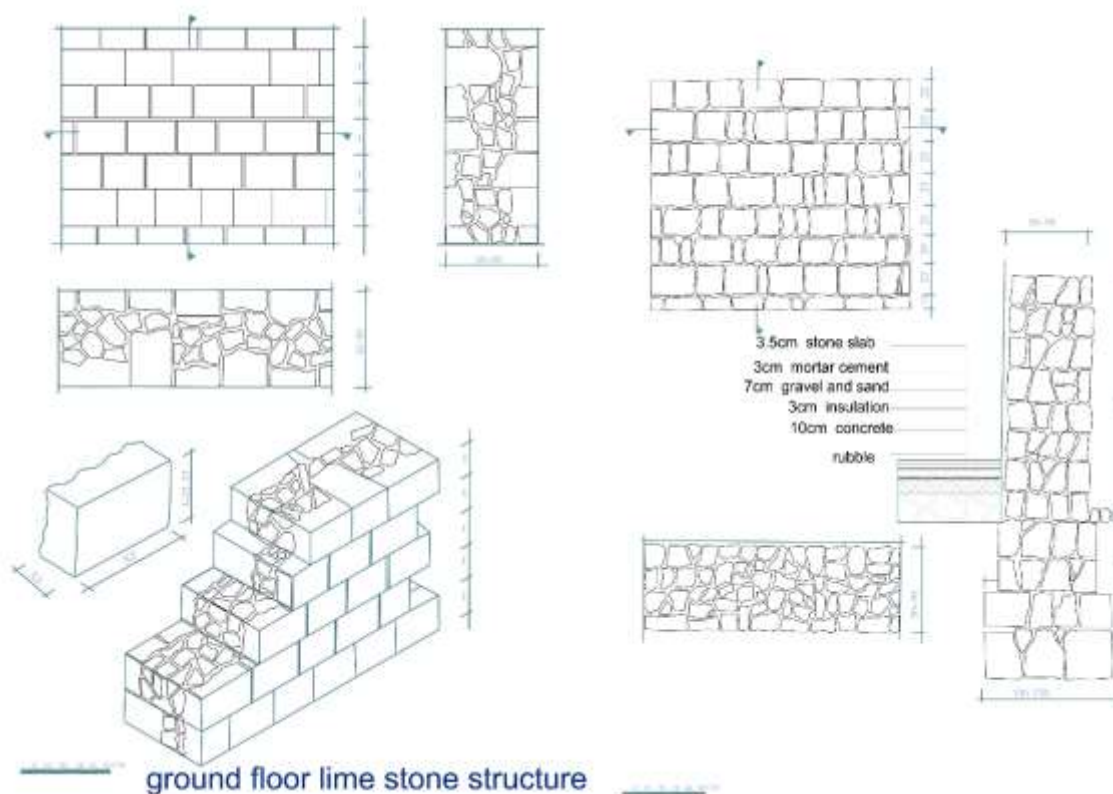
BAB AL SALAM HOUSE stone wall structure for ground floor.
